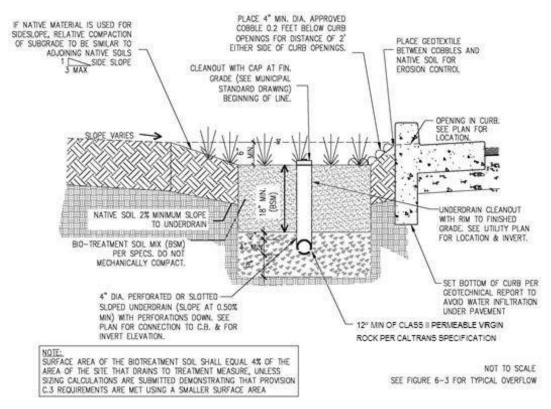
Cross-section of Bioretention Area Showing Inlet from Pavement
